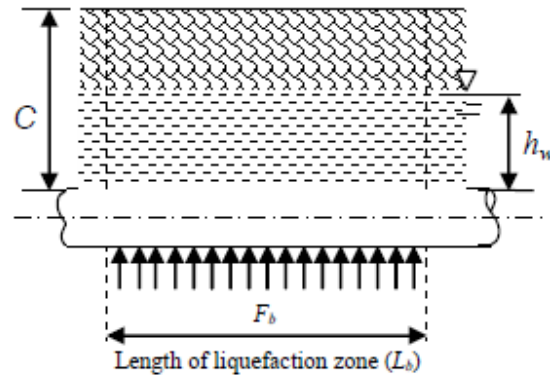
Longitudinal section of the pipeline showing the forces acting on it due to buoyancy.
